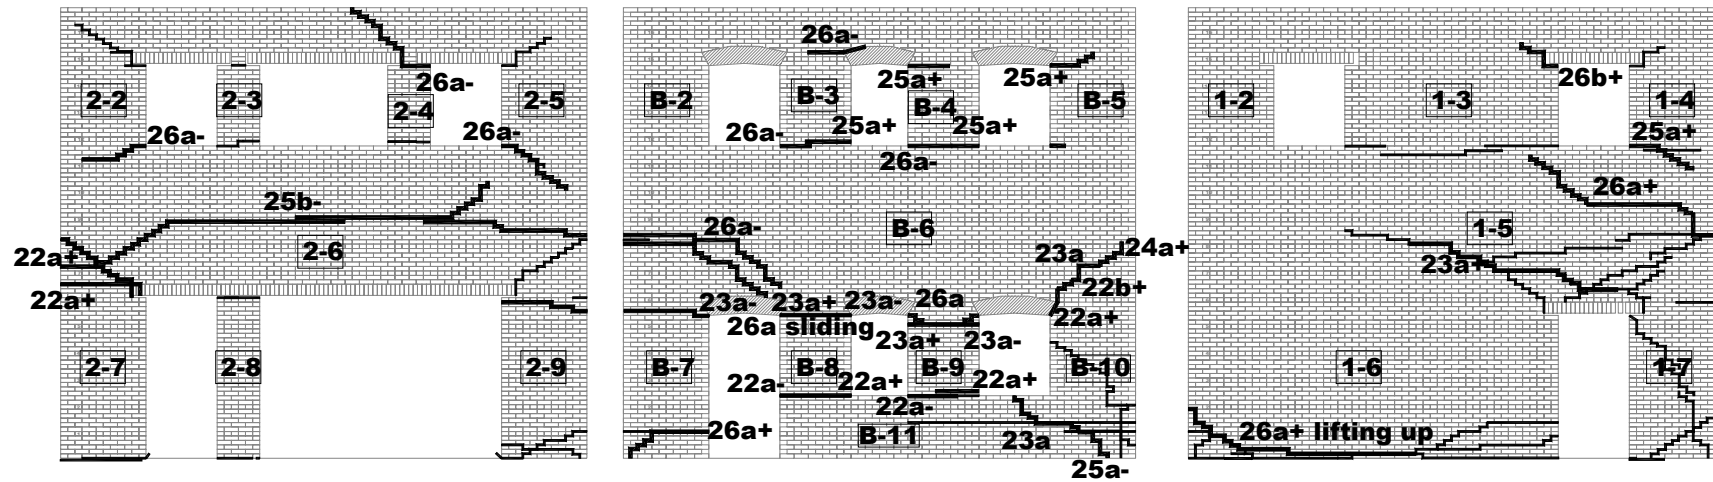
Crack pattern of Wall B and adjacent Wall 2 (left) and Wall 1 (right) at the end of Cycle 26b. The crack number corresponds to the test run number. Number IDs of each pier are given in the rectangles.
